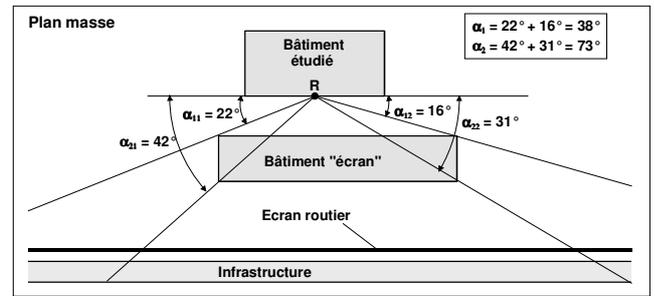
Calculation of the angles of view of the ground transportation corridor from point R located on the facade of the building of interest
